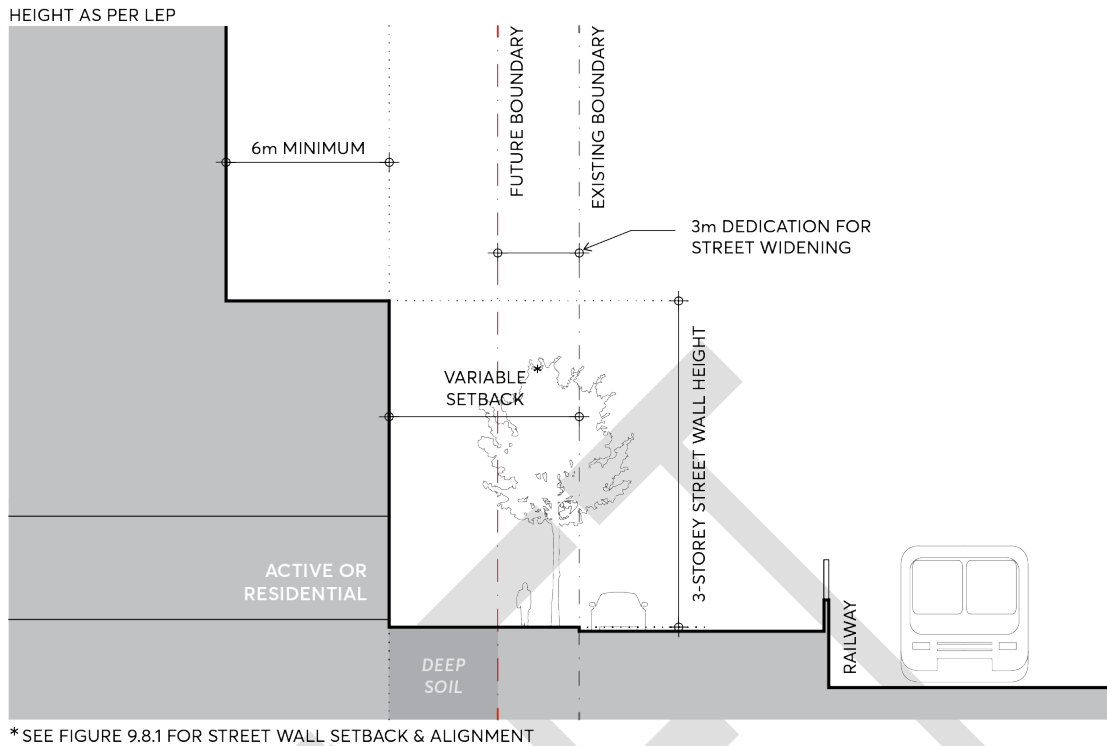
Station Street West (Section A) Setbacks and Street Wall Height
